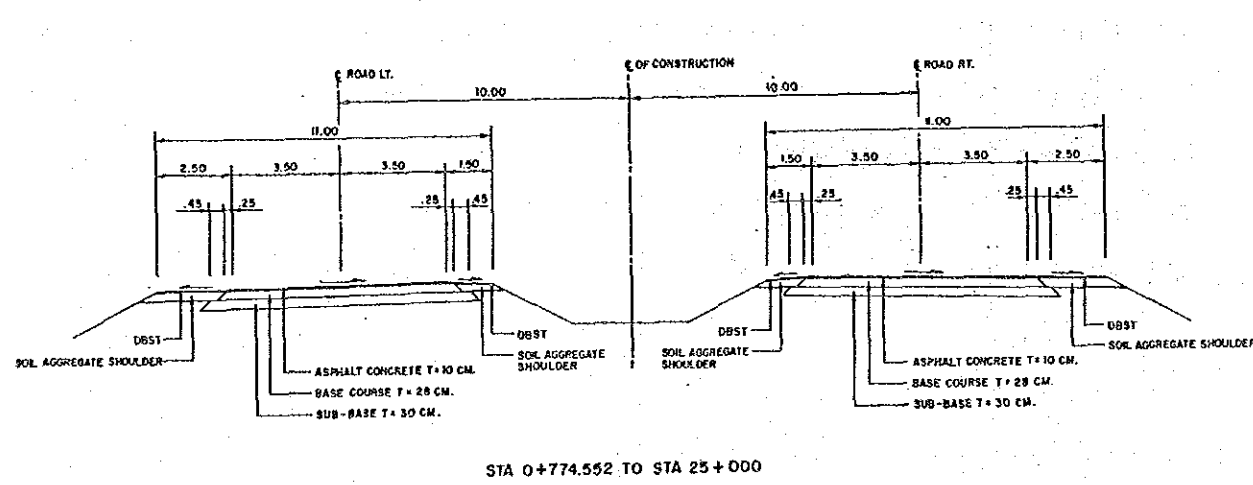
FIGURE TYPICAL PAVEMENT STRUCTURE FOR FLEXIBLE PAVEMENT ML-9.1
